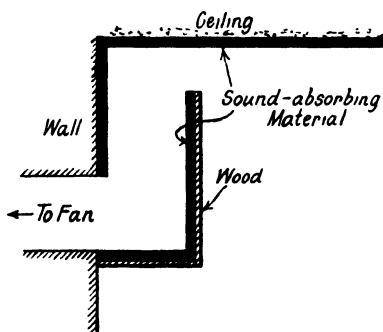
BAFFLE BOX CONSISTING OF ABSORBENT-LINED BOX BUILT OVER ROOM OUTLET
